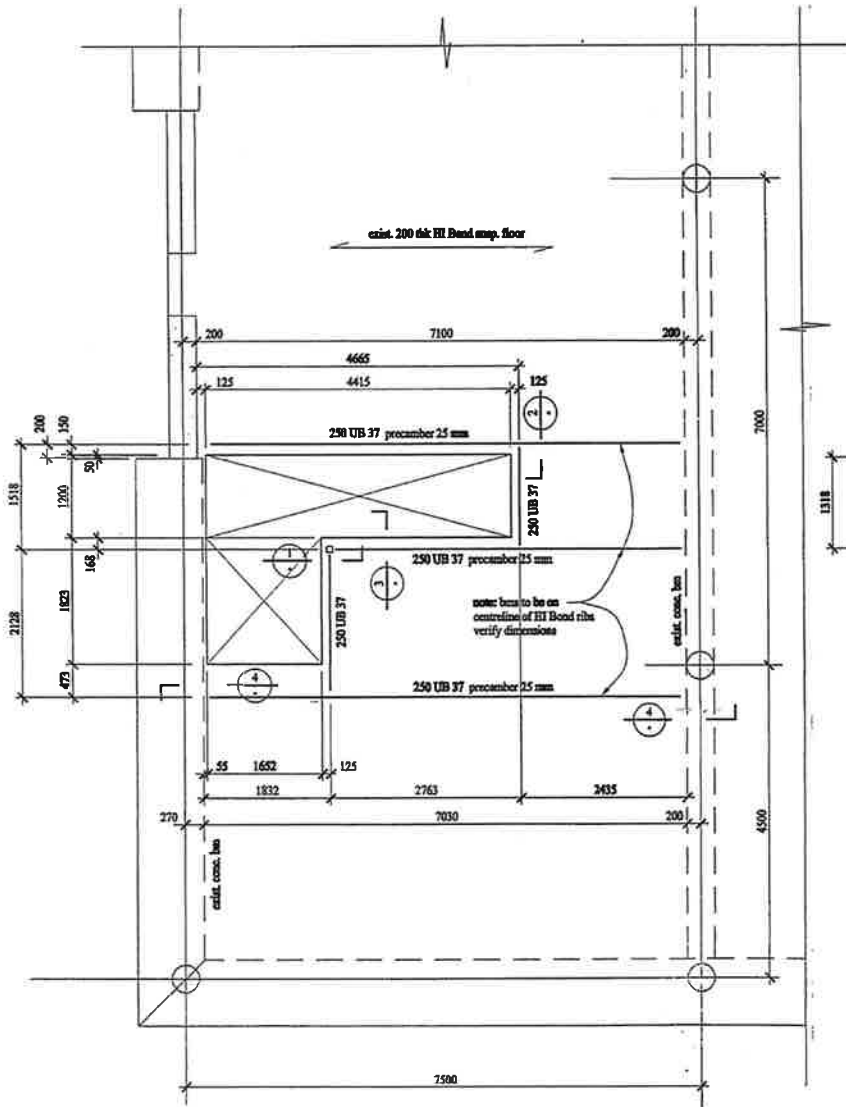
Showing plan of vertical bars in end of south wall and drilled holes from trimmer beam
